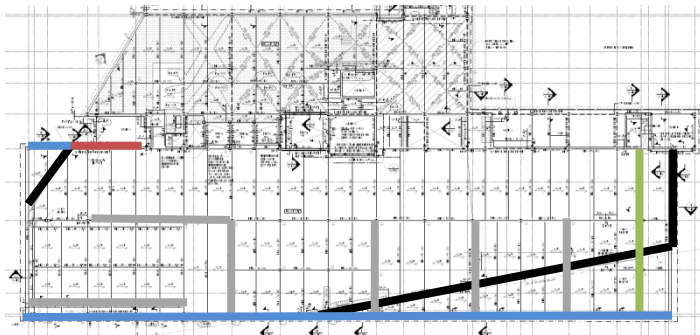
Level 5 framing plan showing regular layout against building footprint (S-105)
